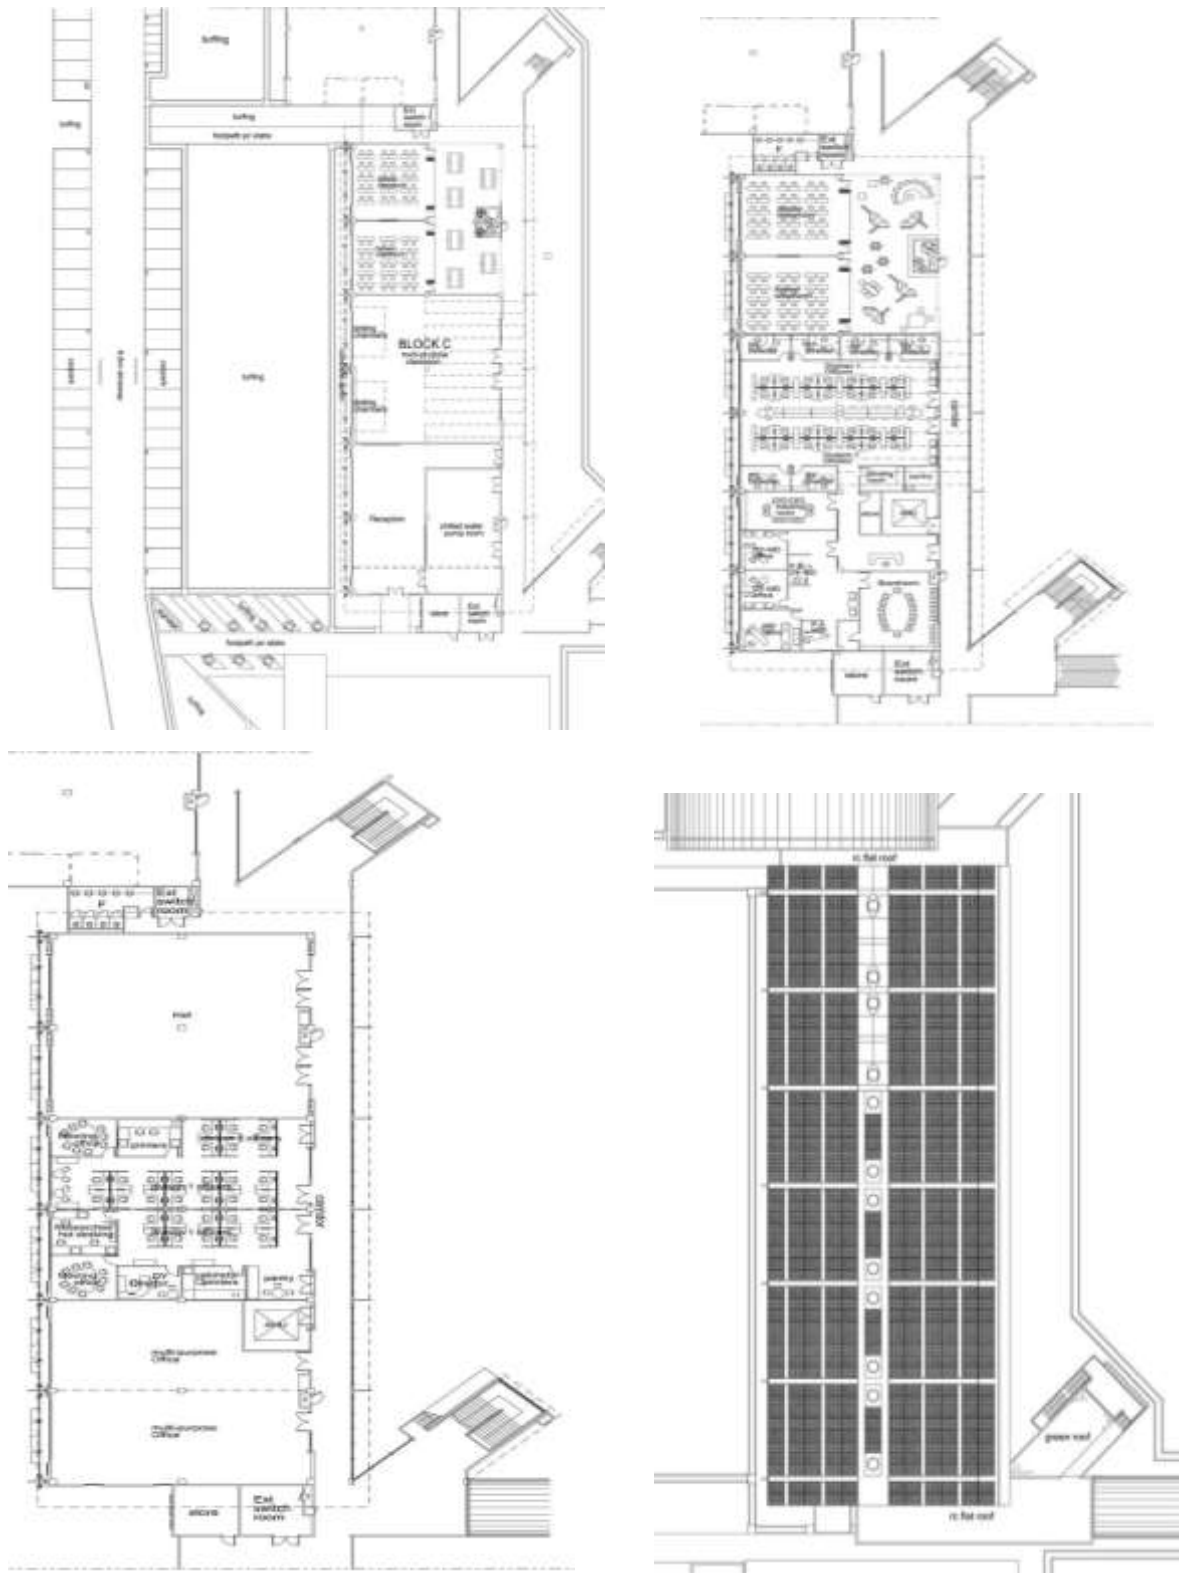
Floor Plans (<http://architazer.com/projects/zero-energy-building-at-bca-academy/>)
